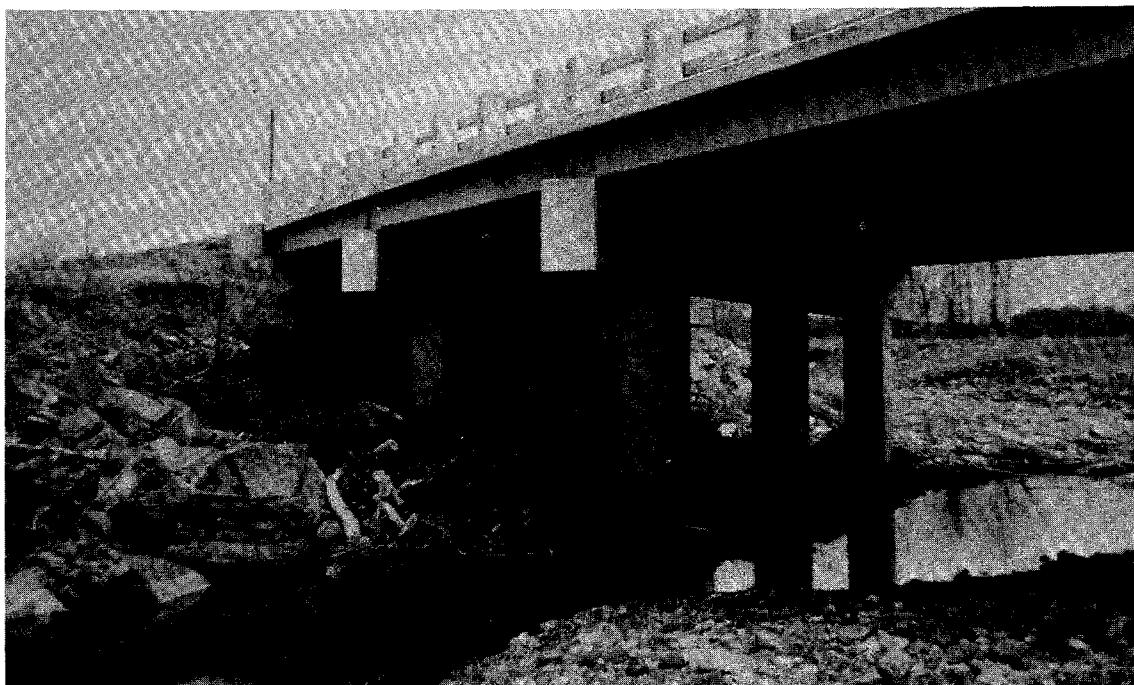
View toward upstream side of left abutment, SR-206 bridge, March 25, 1976.
